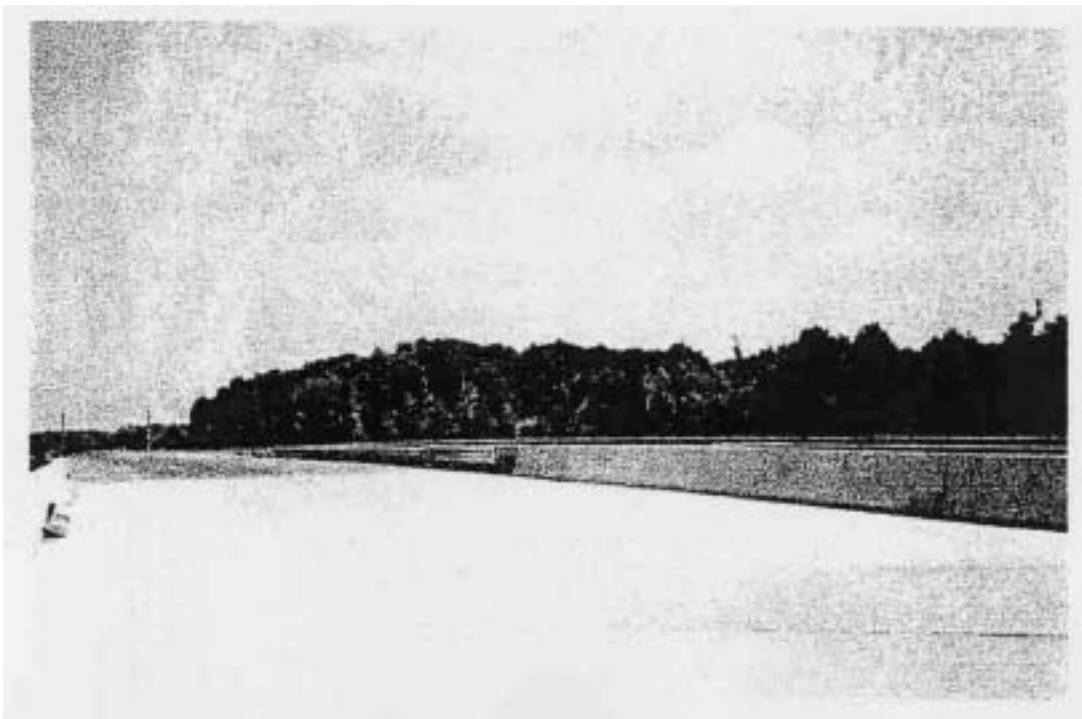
Bridge Deck over Wyckoff Road Westbound near Completion
